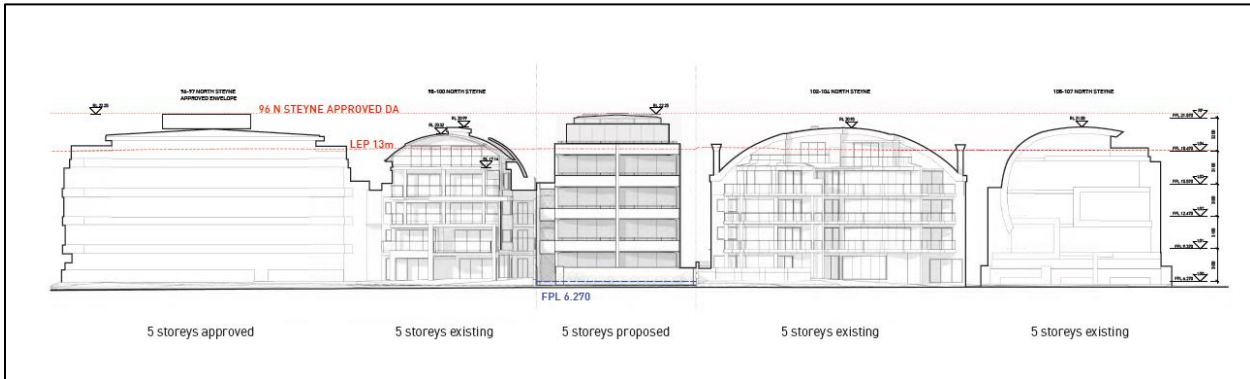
Streetscape Elevation (Source: Smart Design Studio, 2024)
